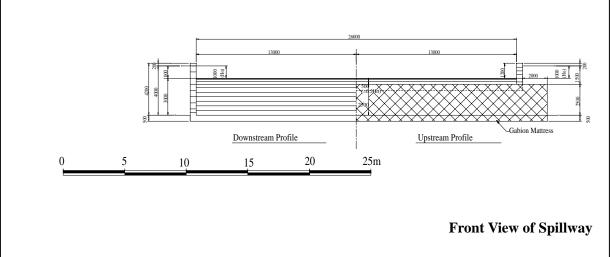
(2/3) Outlet Structure for Subdivision of 100ha
